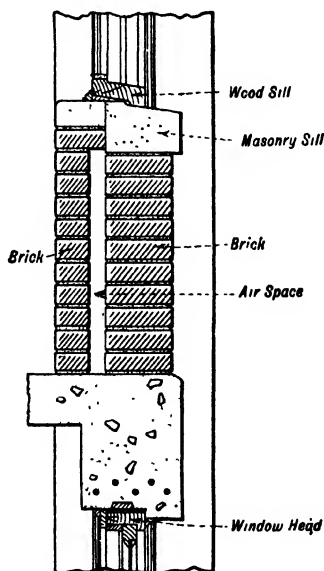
Section through Spandrel Beam. Concrete and Brick Exterior. (See p. 739.)
